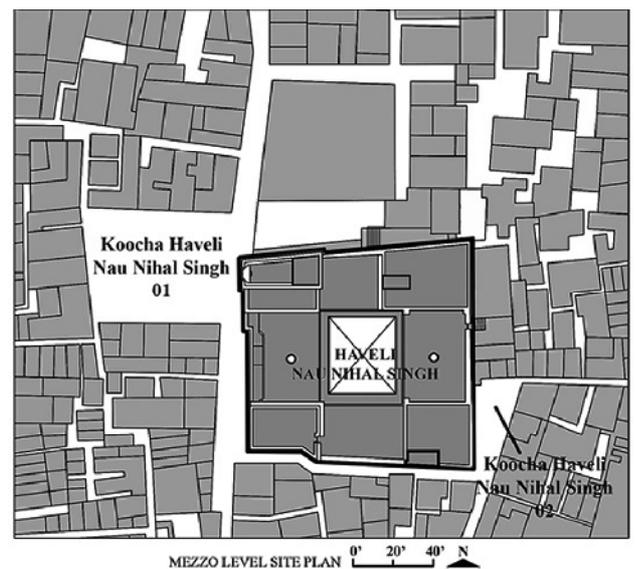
Site Plan of *Haveli* Nau Nihal Singh
